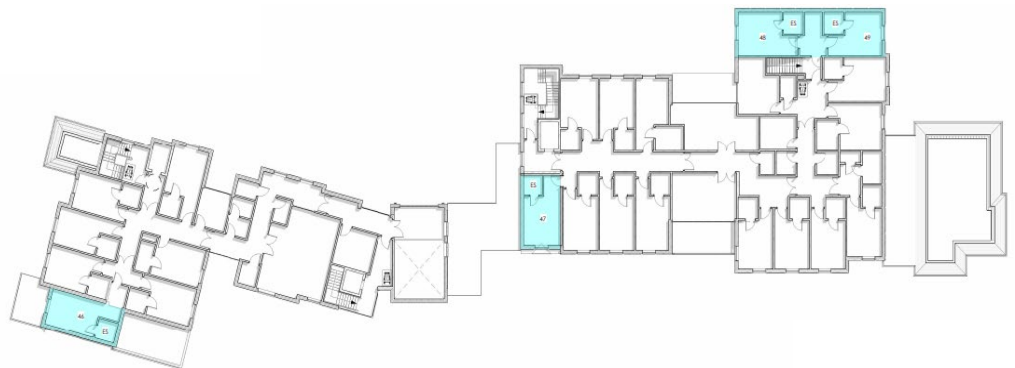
First Floor Plan as Proposed – Proposed Extensions highlighted blue
